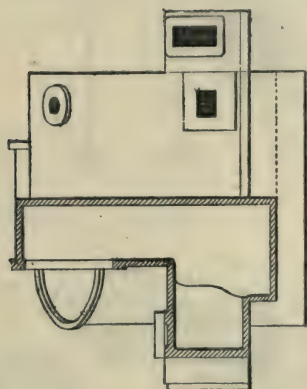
, the plan and elevations of the starting platform; Fig. 5360, the hand-rails and stanchions; Fig. 5361, the hand-rail support brackets.
